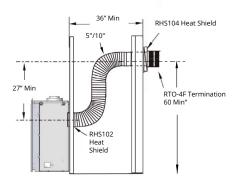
f RHS 102 & RHS 104 Installation. (Minimum requirements).
